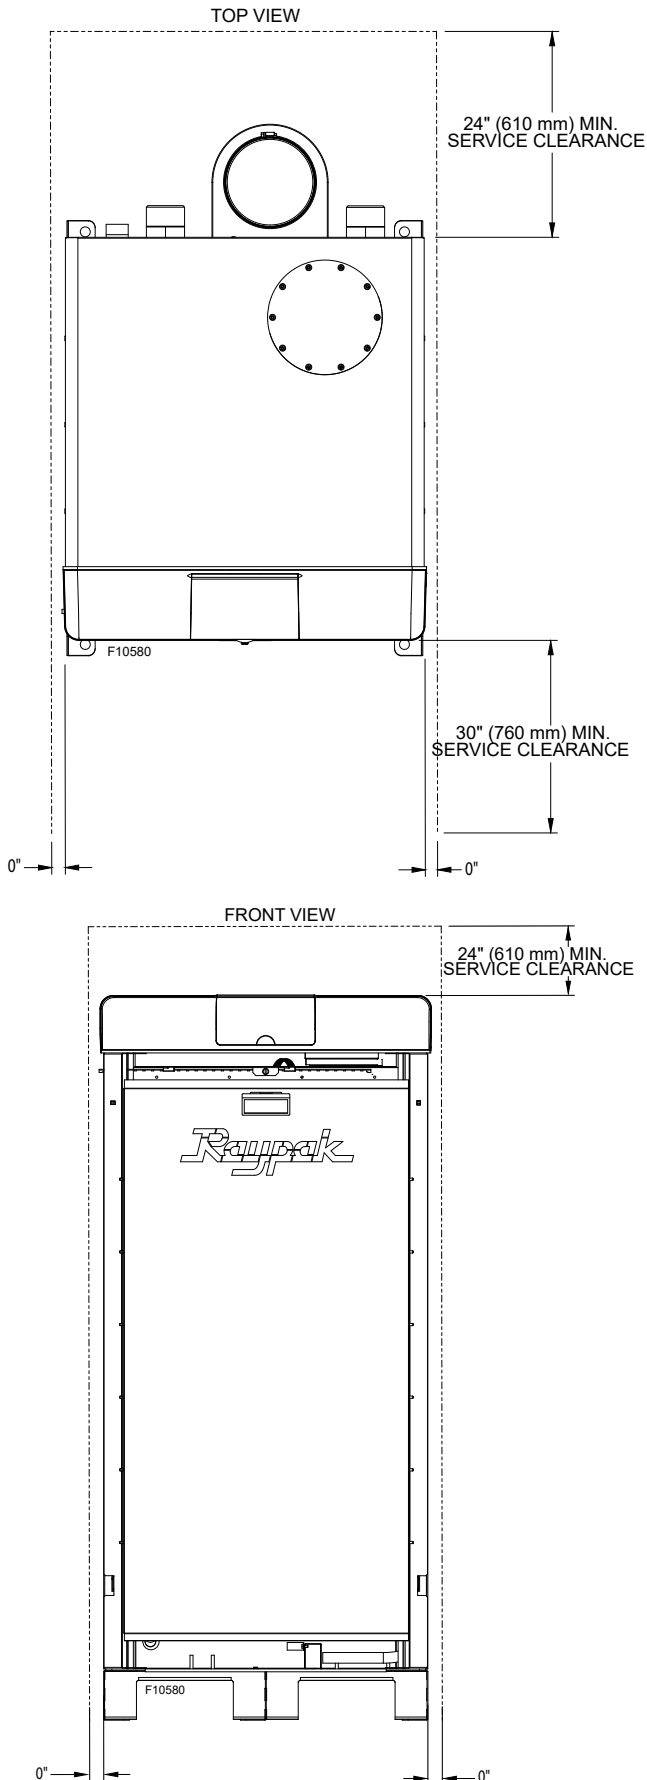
Minimum Clearances from Combustible Surfaces – Indoor and Outdoor Installations
